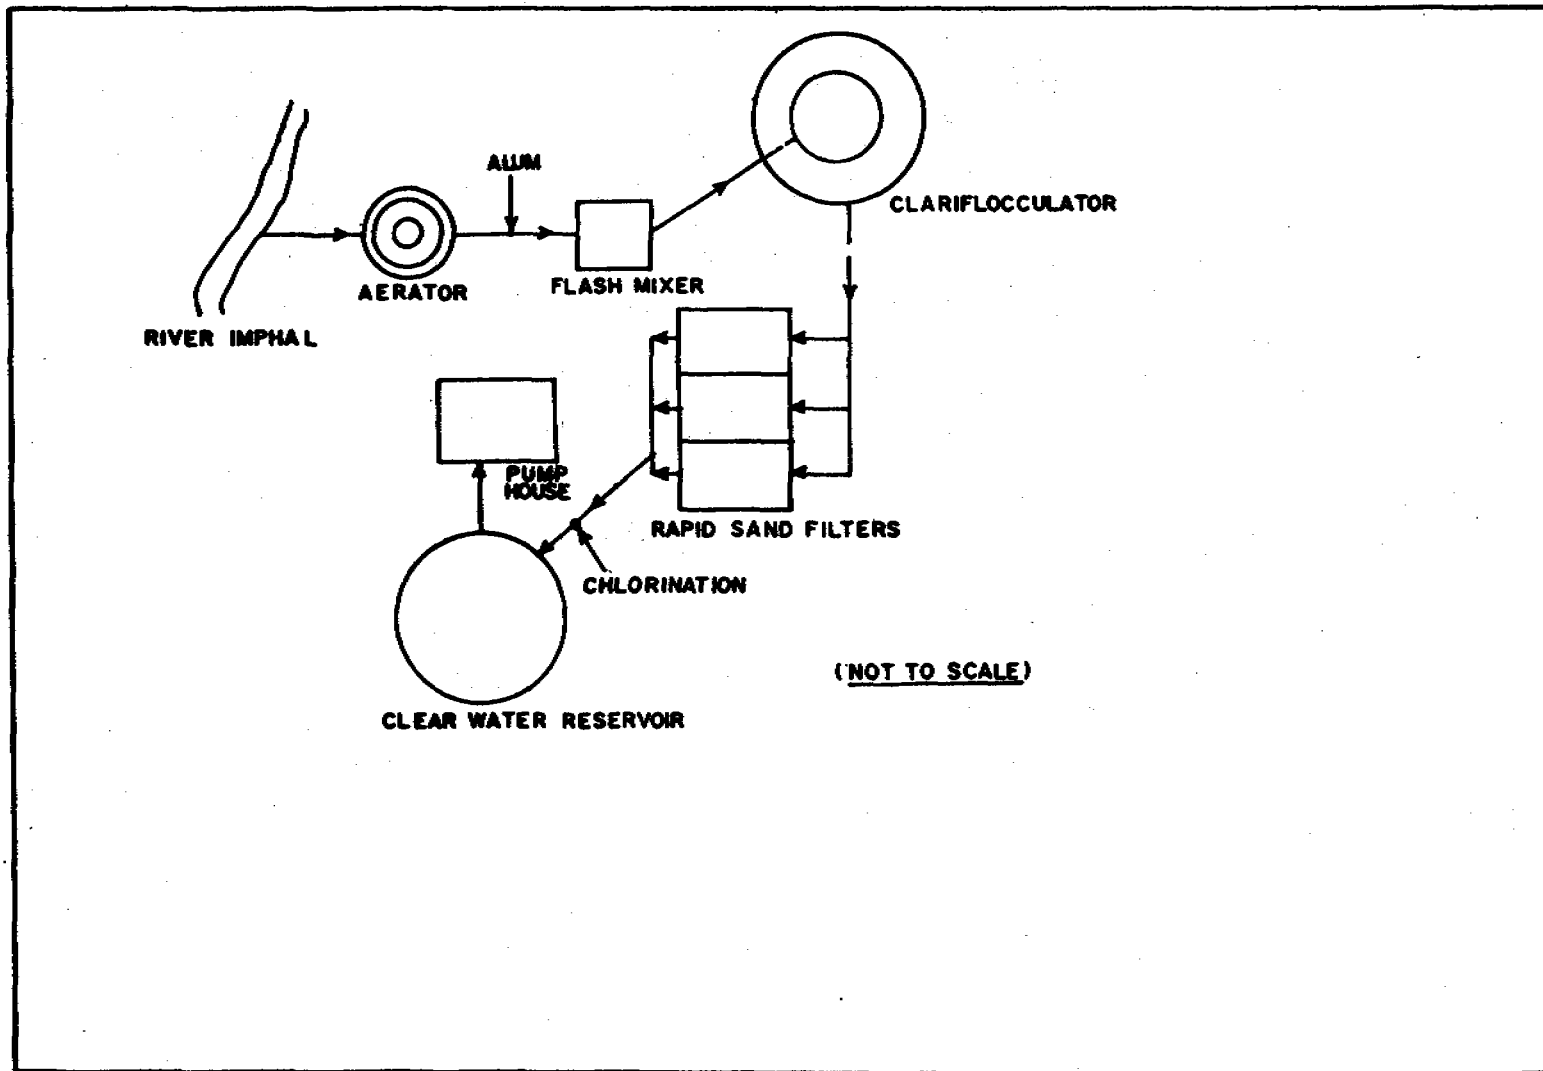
LAYOUT PLAN OF IMPHAL WATER TREATMENT PLANT, MANIPUR
